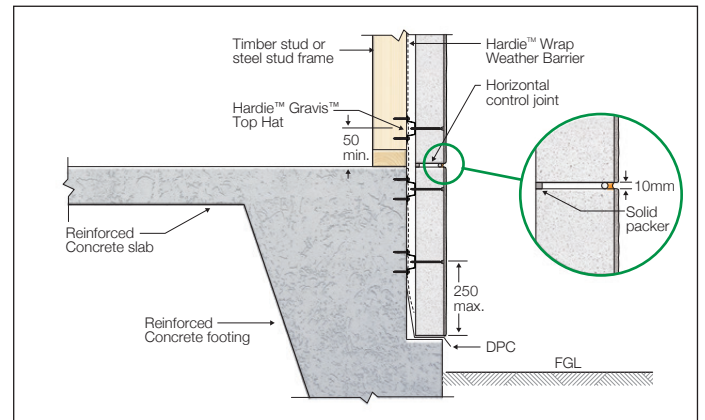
JUNCTION TO DEEP CONCRETE EDGE BEAM
